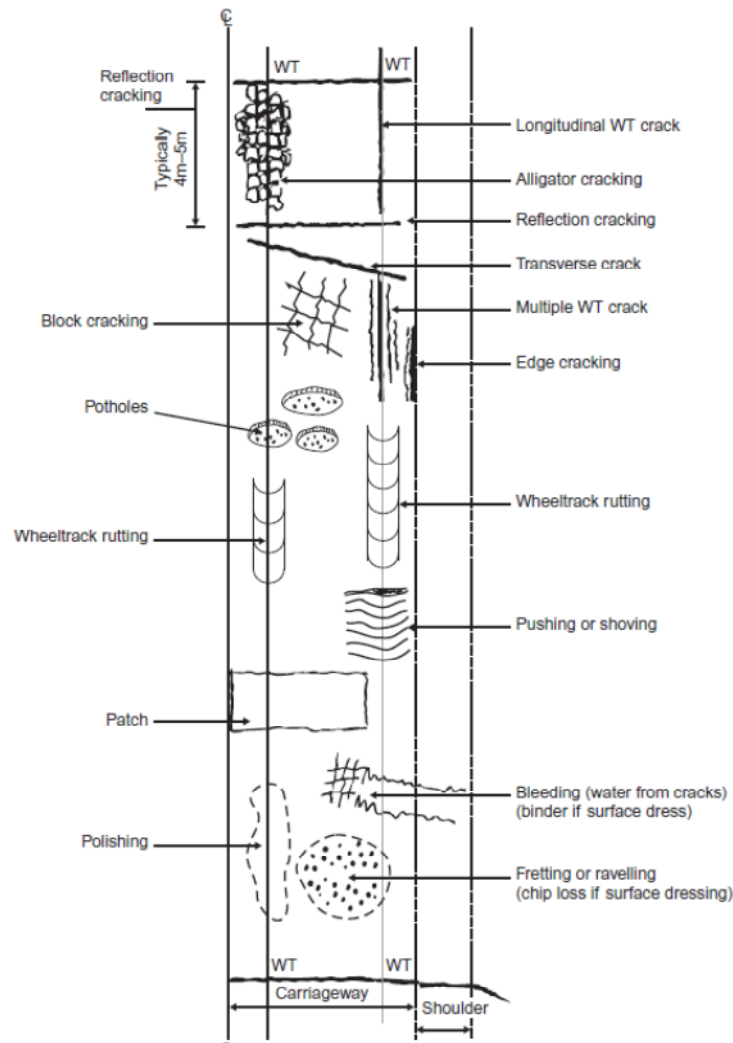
Asphalt pavement generic distress patterns (Pearson, 2011).
